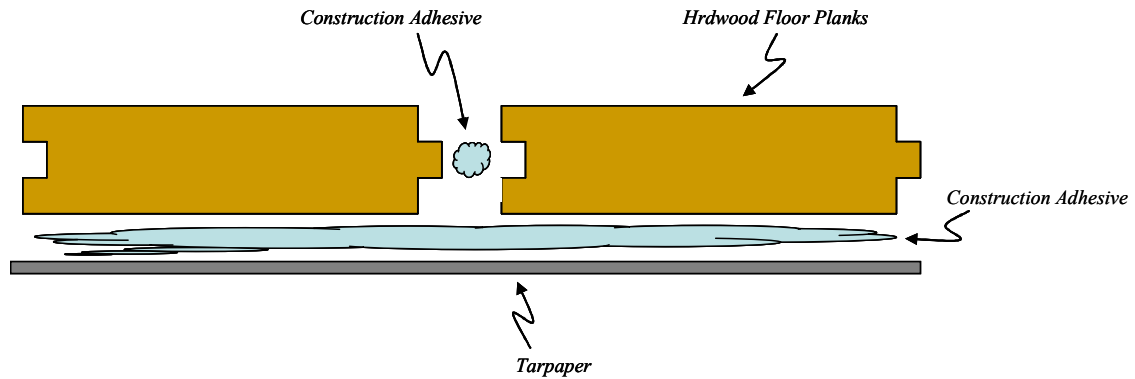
Adhesive points between planks and on the tarpaper in construction of the hardwood test articles.
